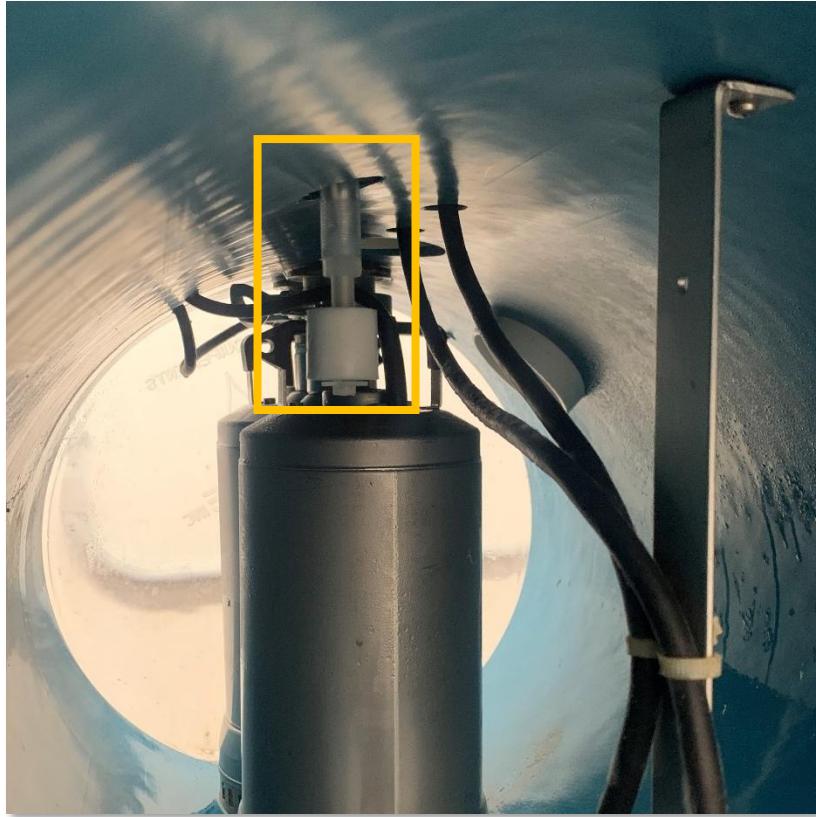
Horizontal extractor emergency float installed – extractor inside view
